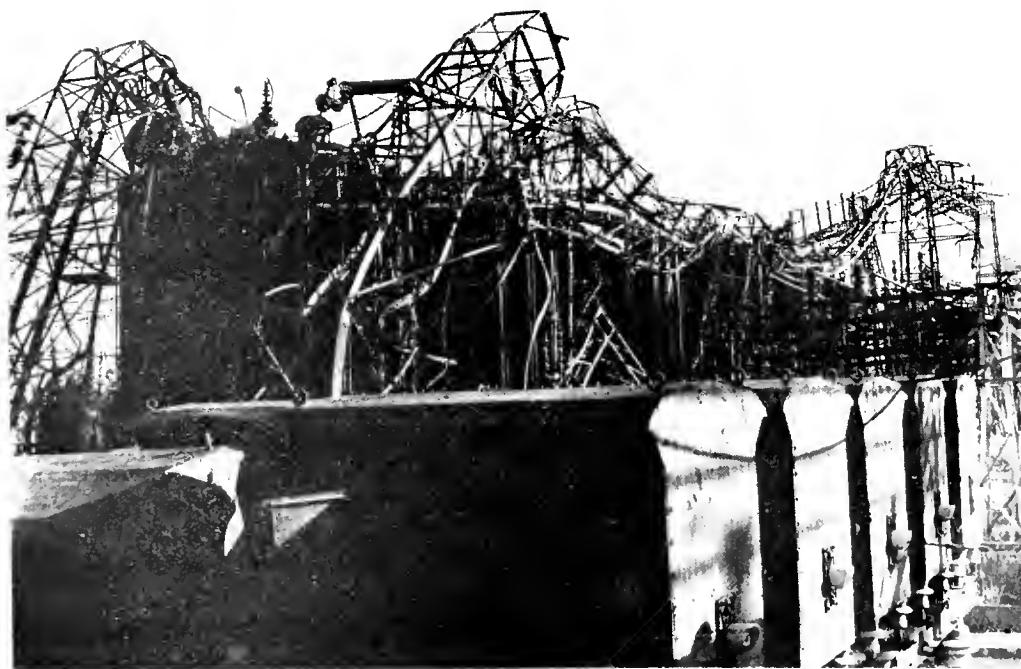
Another view of damaged transformers and structure, with outdoor grounding resistors in foreground
